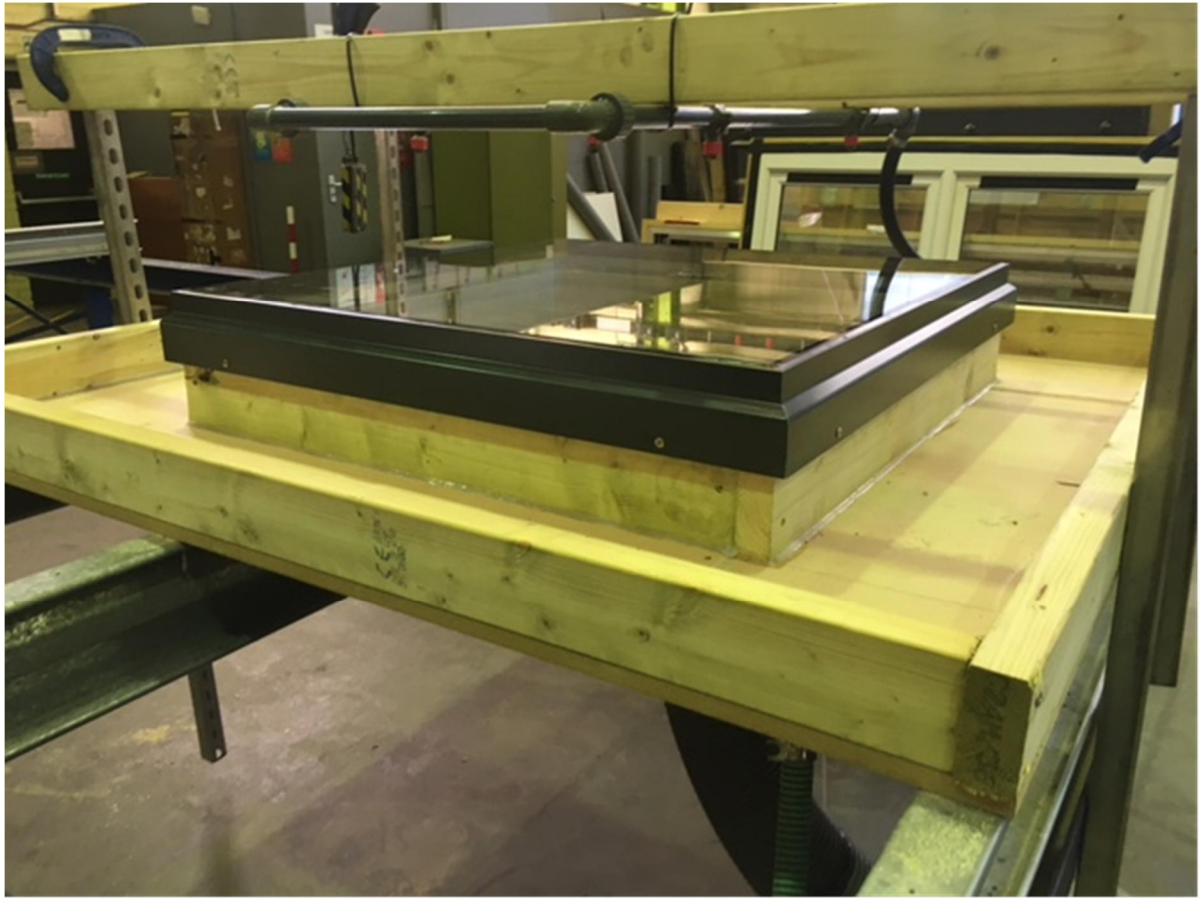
Roofglaze Ltd Flatglass Rooflight installed on BRE Test Rig
